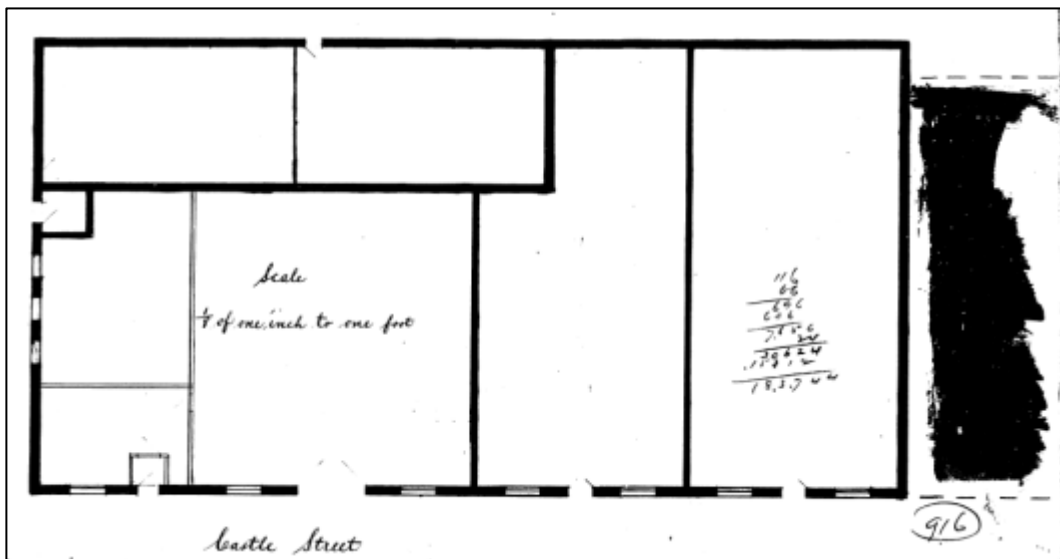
1907 plans showing the building along Castle Street built between 1907 and 1910 on Sections 72 and 73 abutting the earlier brick building in Section 71. (DCC Archive).
